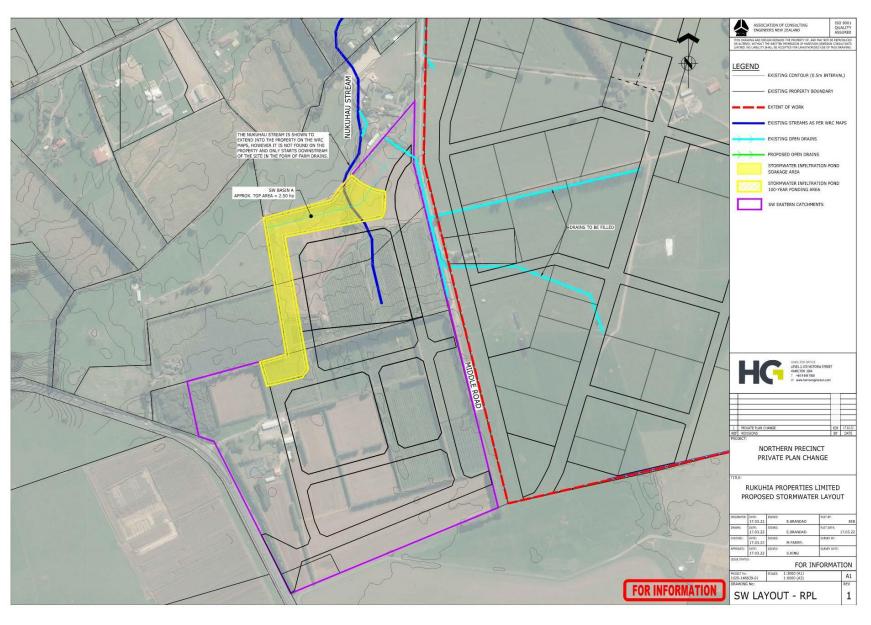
RPL BLOCK STORMWATER LAYOUT
